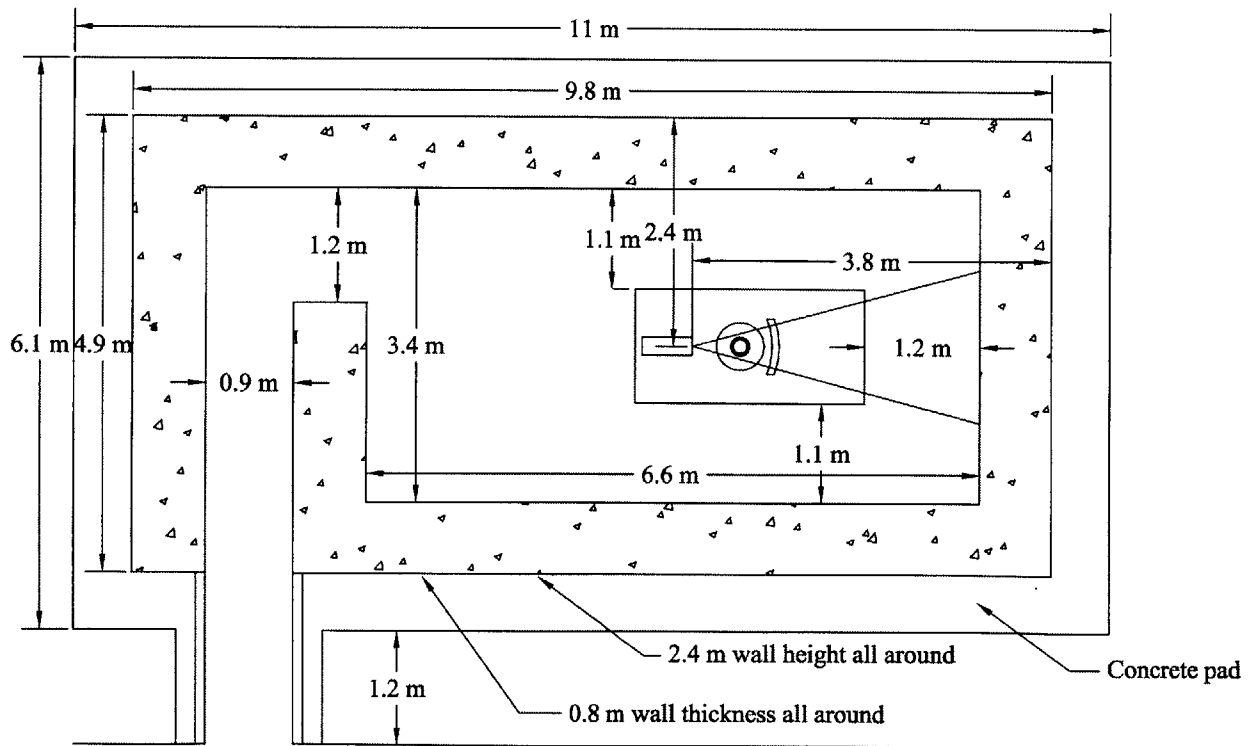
Floorplan of the shielded room designed to house the high-energy CT sensor.
